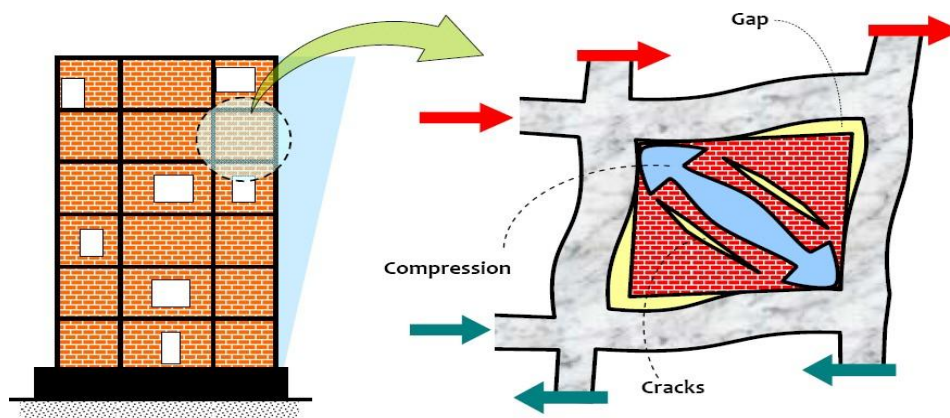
Deformation of reinforced concrete frame building with earthquake repellent infill walls.
